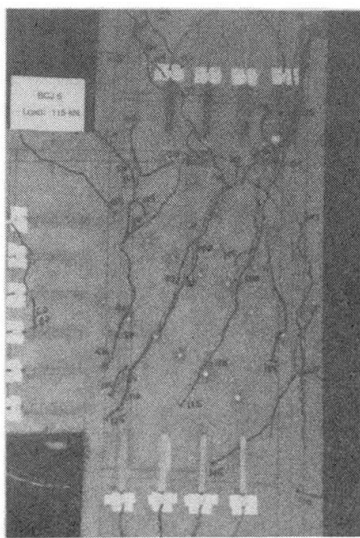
a) BCJ6 – without stirrups – 115 kN
